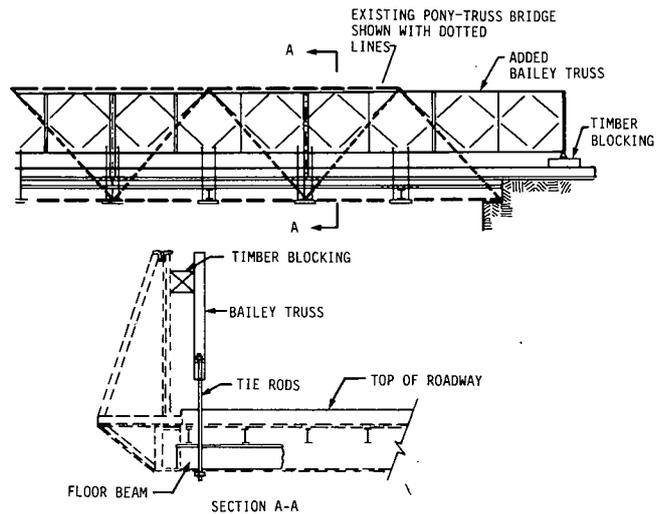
Reinforcing of a pony-truss bridge with Bailey trusses.
